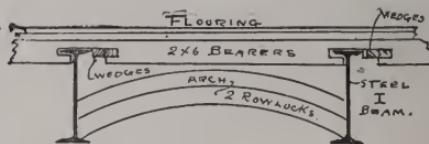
SECTION SHOWING METHOD OF WEDGING BEARERS.
